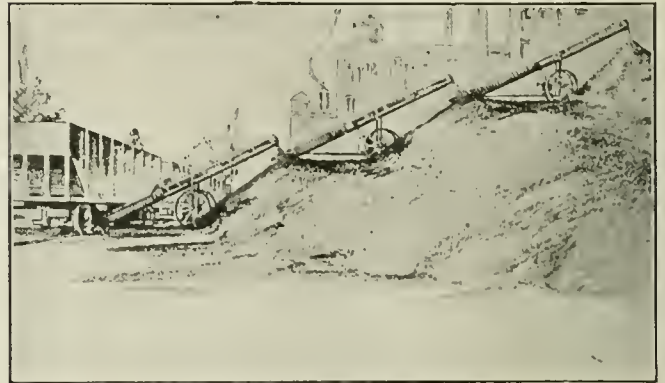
UNLOADING CAR WITH THREE CONVEYORS
